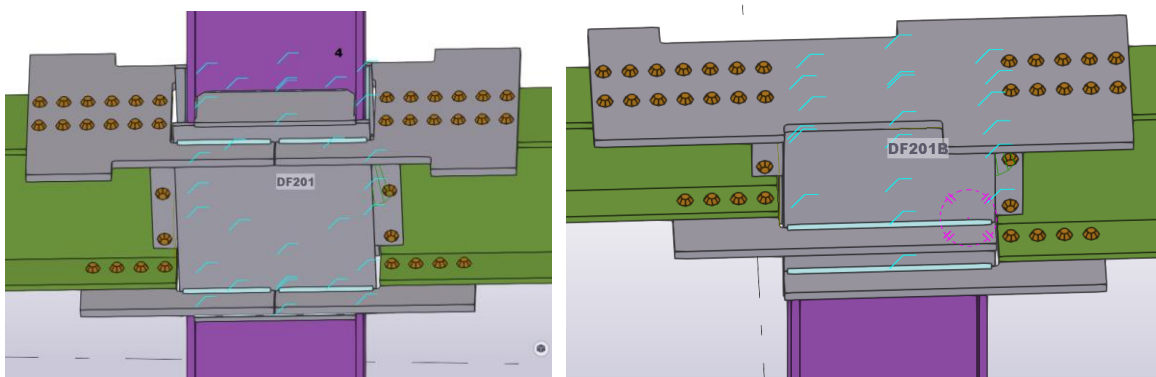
R3 Extended Top Plates (lower and roof conditions)
